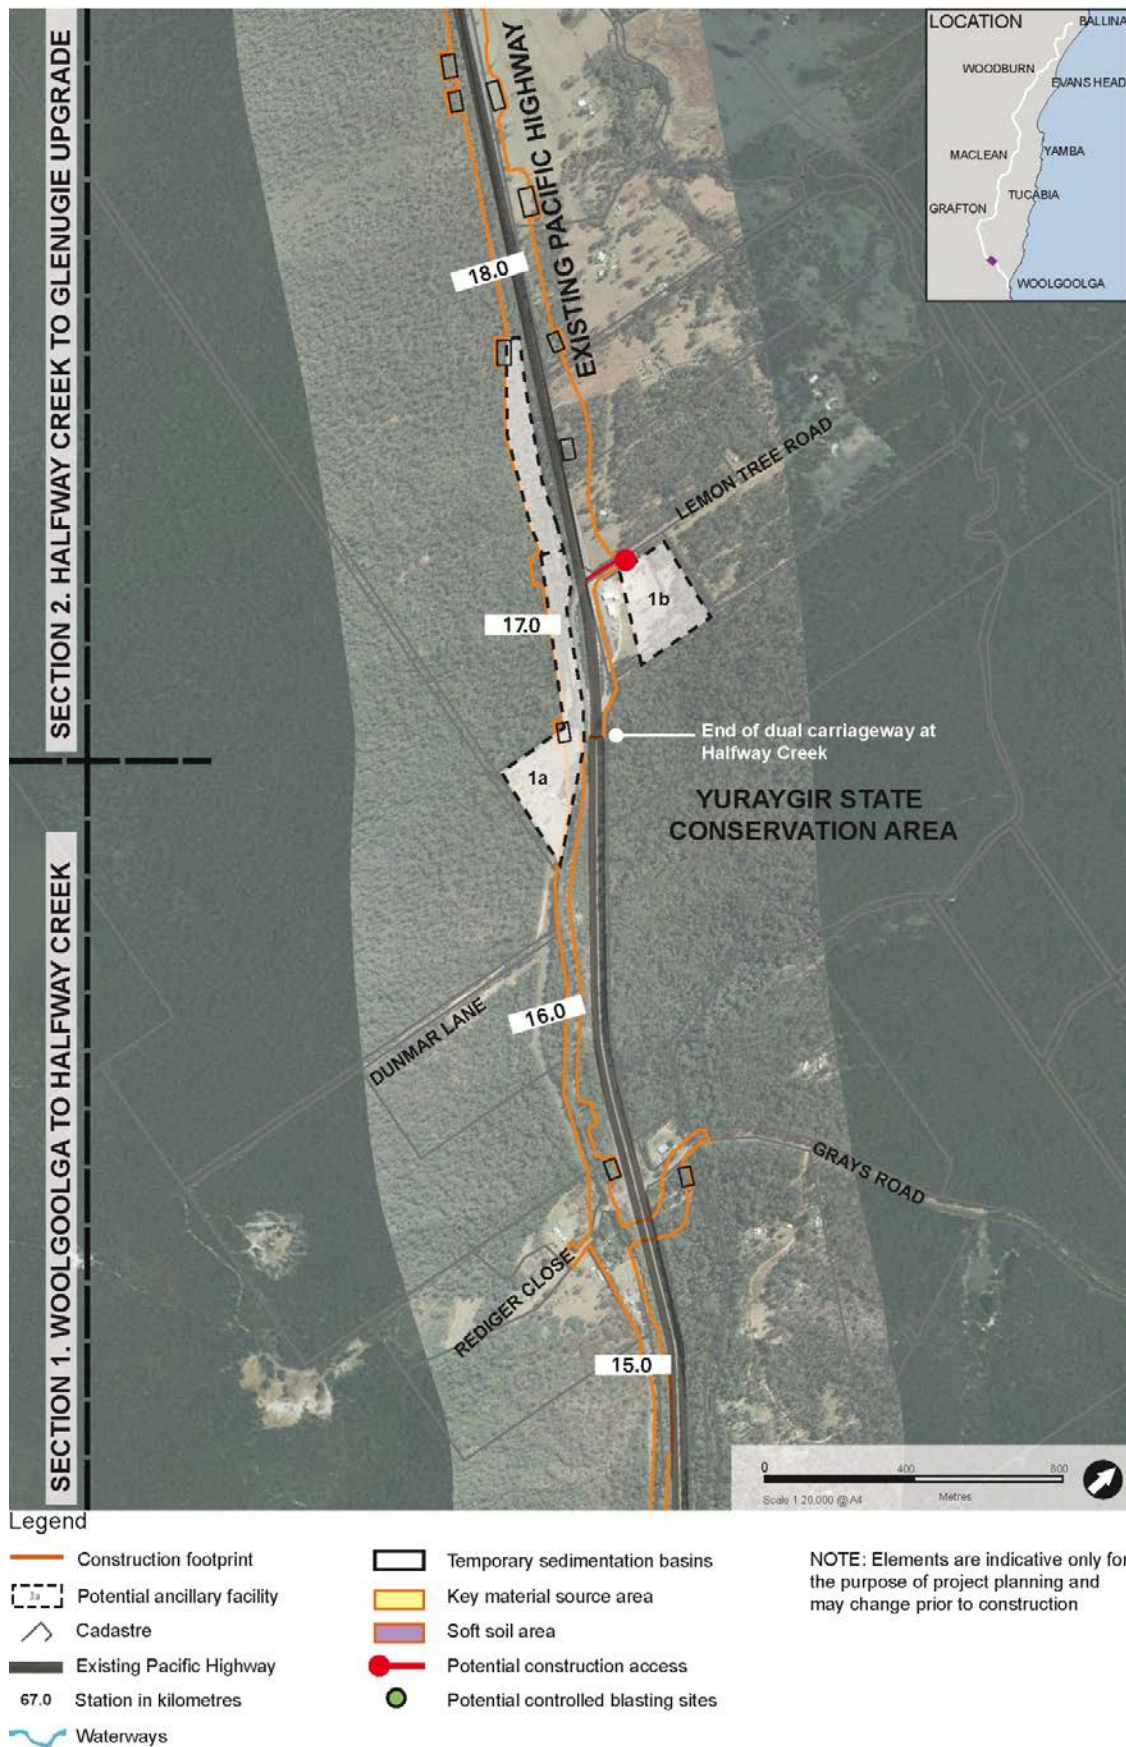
Extent of construction and construction features Section 1 (Station 15.0 to 18.9)
